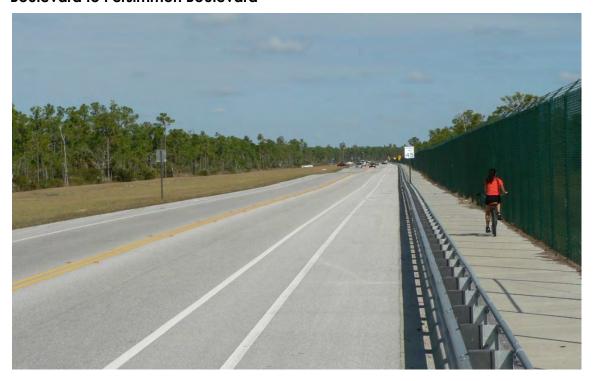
Existing Two Lane County Facility (Looking North) from Ibis Entrance to Northlake Boulevard
